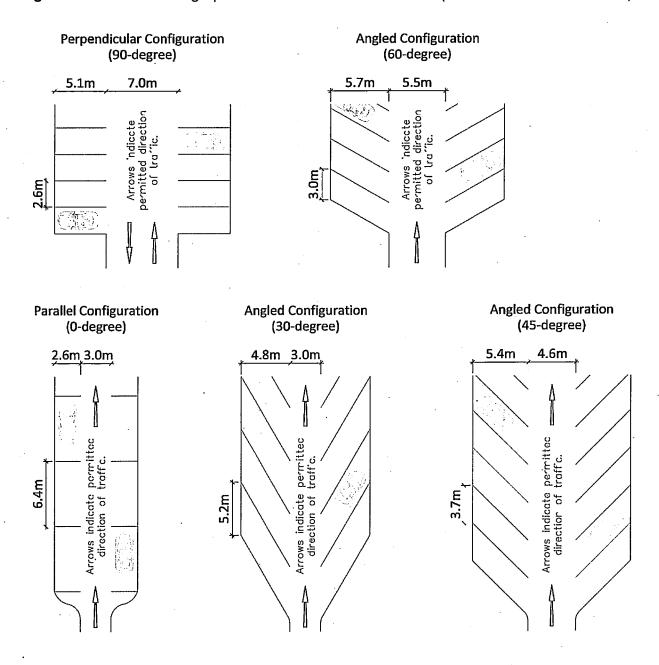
Minimum Parking Space and Drive Aisle Dimensions (all measurements in metres)
